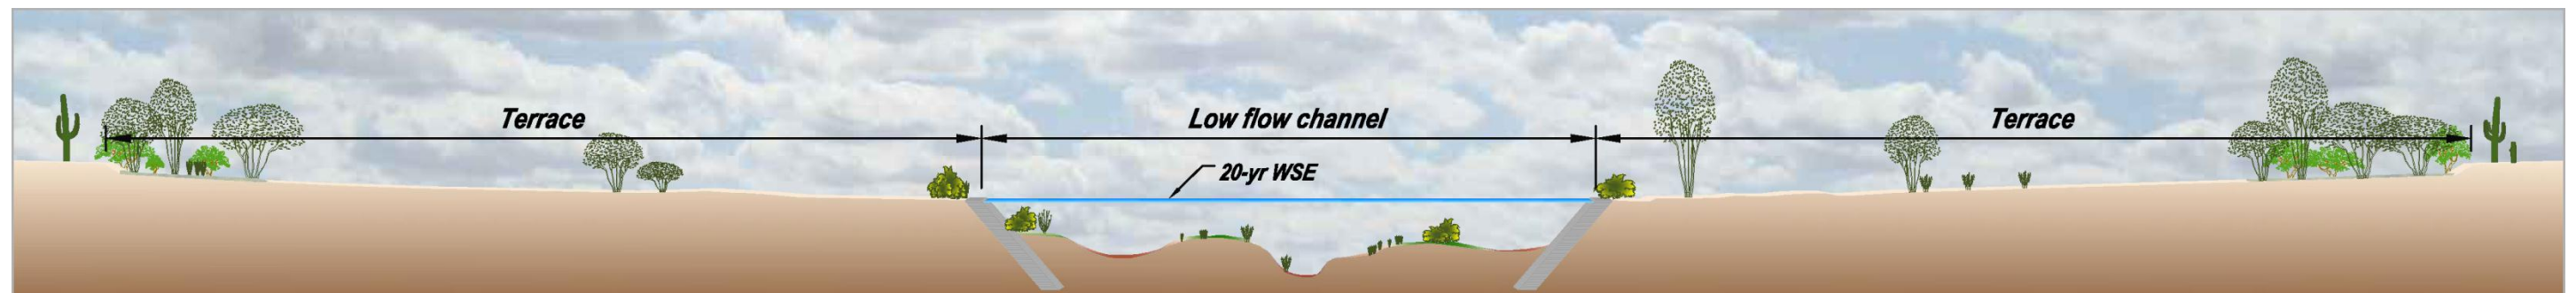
Rendering of FICO's River Master Plan typical cross section through Sahuarita Farms
